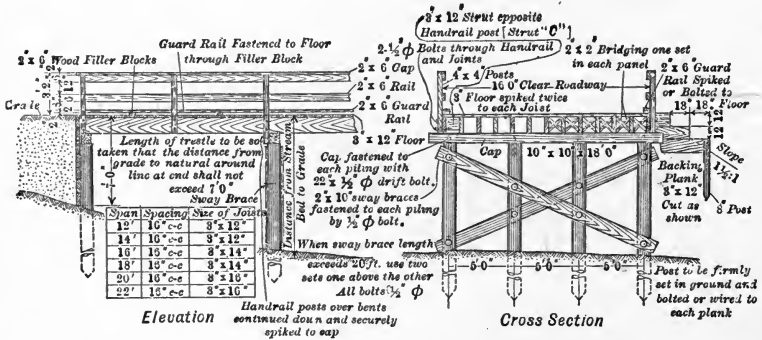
Pile Highway Bridge after Plan by Iowa Highway Commission.
